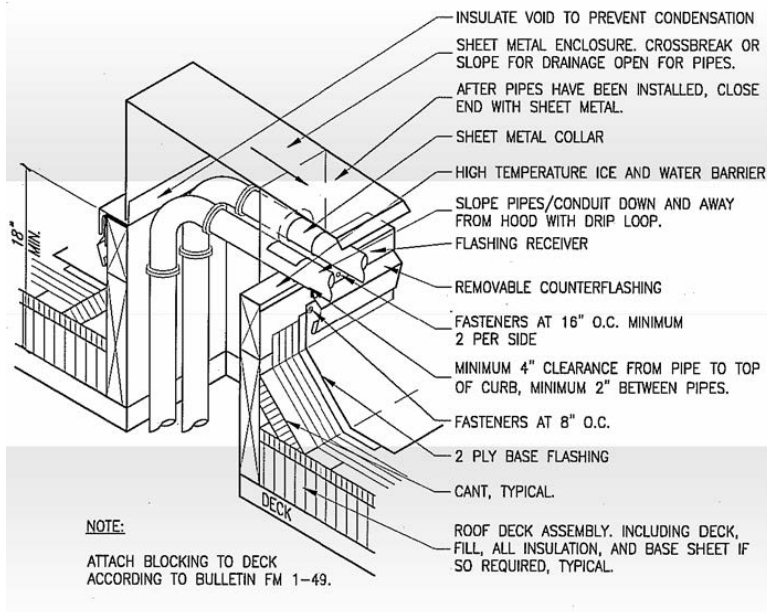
TYPICAL PIPE AND CONDUIT ROUTING DETAIL FOR ROOF INSTALLATIONS
